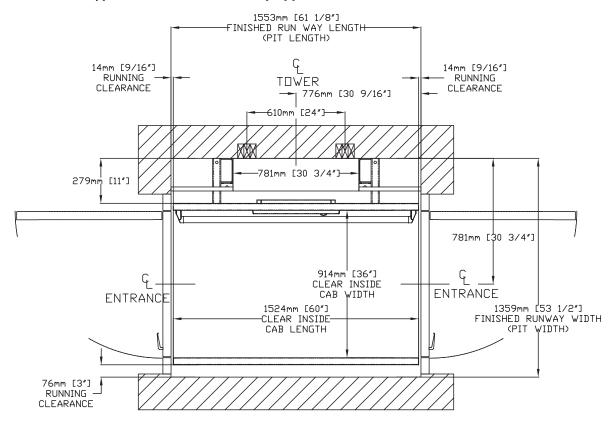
Plan View - Type 2, 36" x 60" Cab, Enclosure Application
